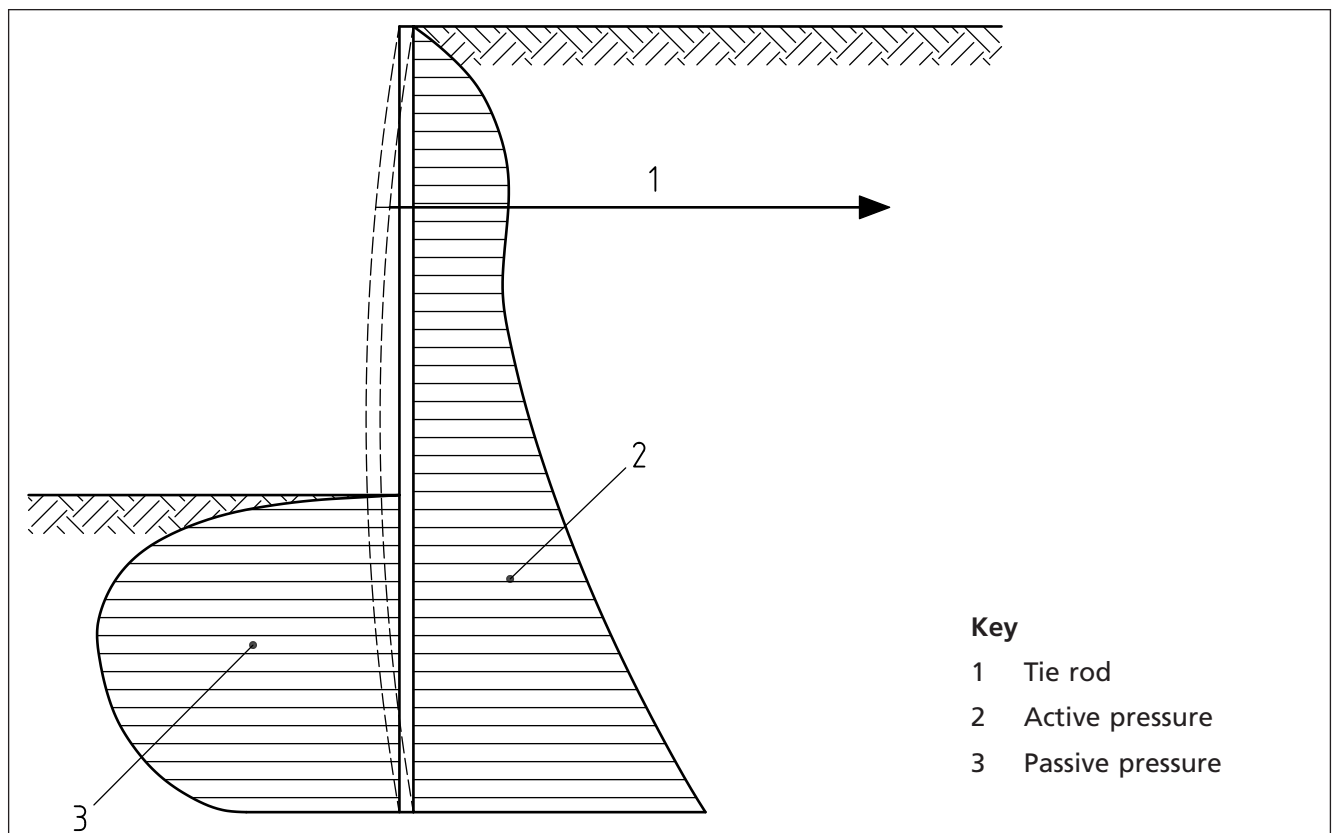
Distribution of earth pressure and earth resistance on anchored single-wall sheet pile structure
